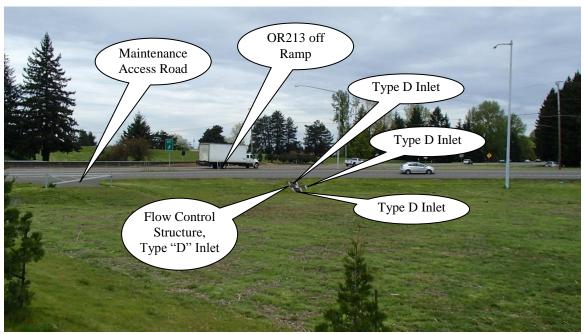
a view of extended detention pond facility looking West toward OR213 off ramp.
